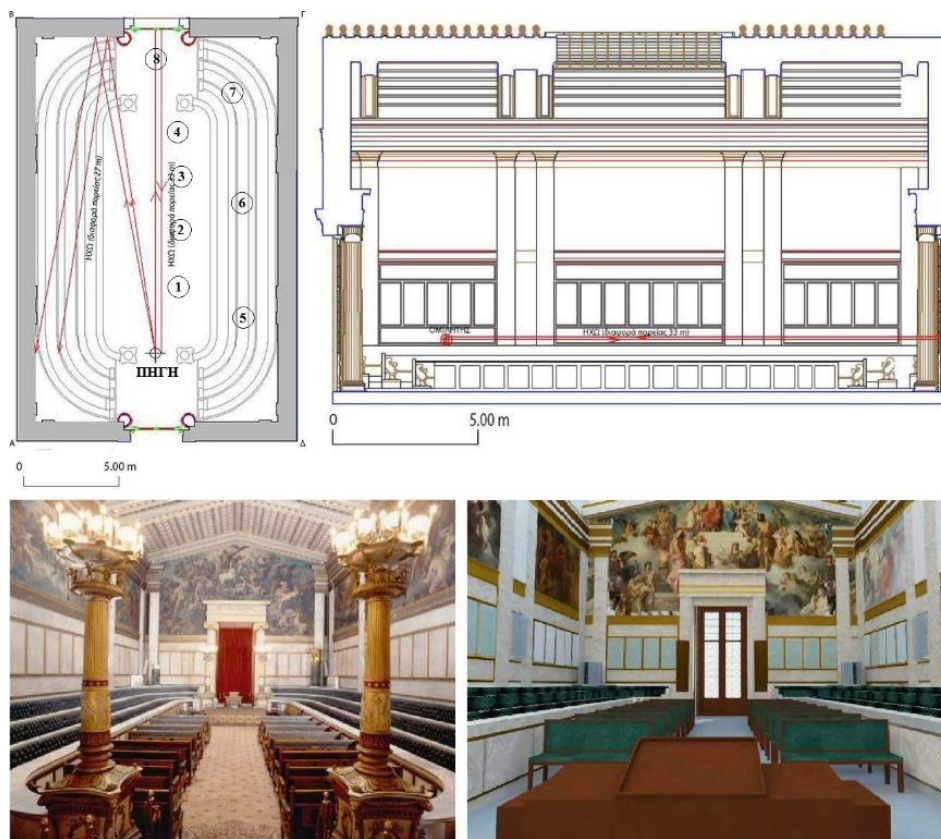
Plan, section, and front view before intervention (left) and rear view after intervention (right) of the Ceremonial Hall of the Academy of Athens
